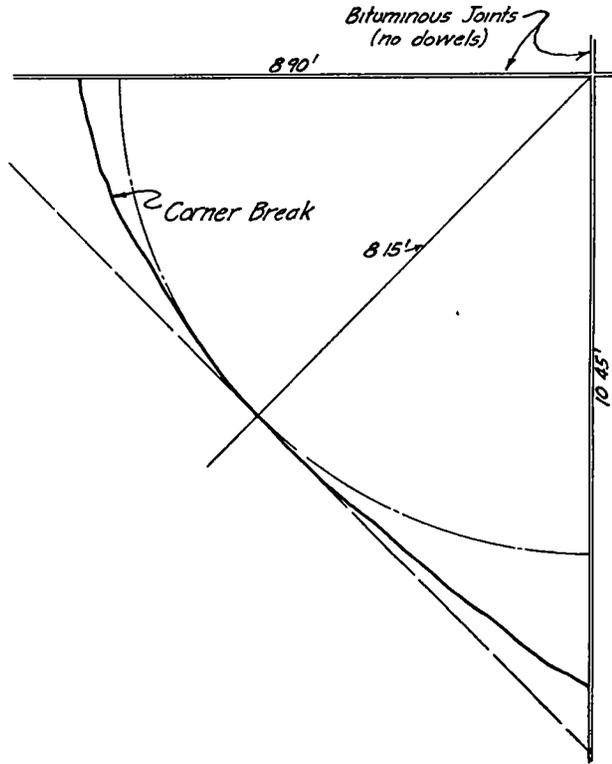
Five-inch Concrete Pavement Reinforced with 6-6-9 wire mesh placed near bottom of slab
